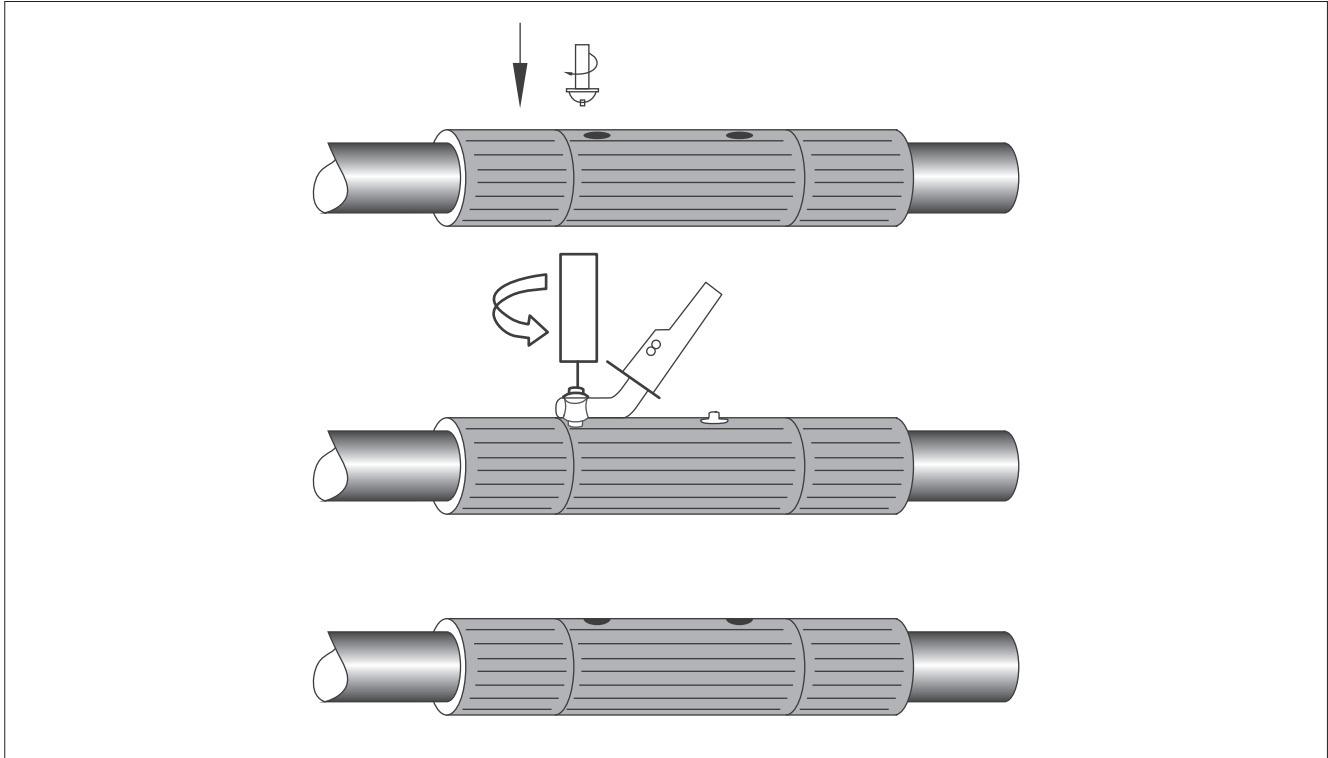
Reaming the openings with a cutter and fusing the blanking plugs
